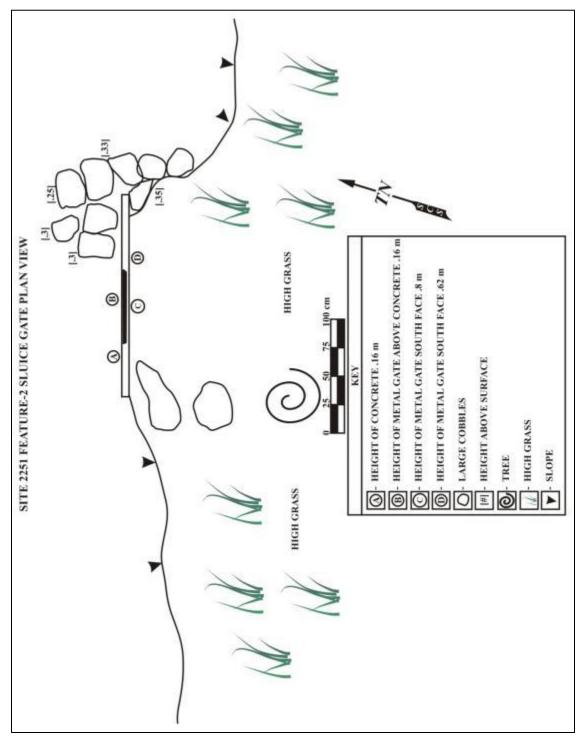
Plan view of Site -2251, Feature 2 sluice gate.
